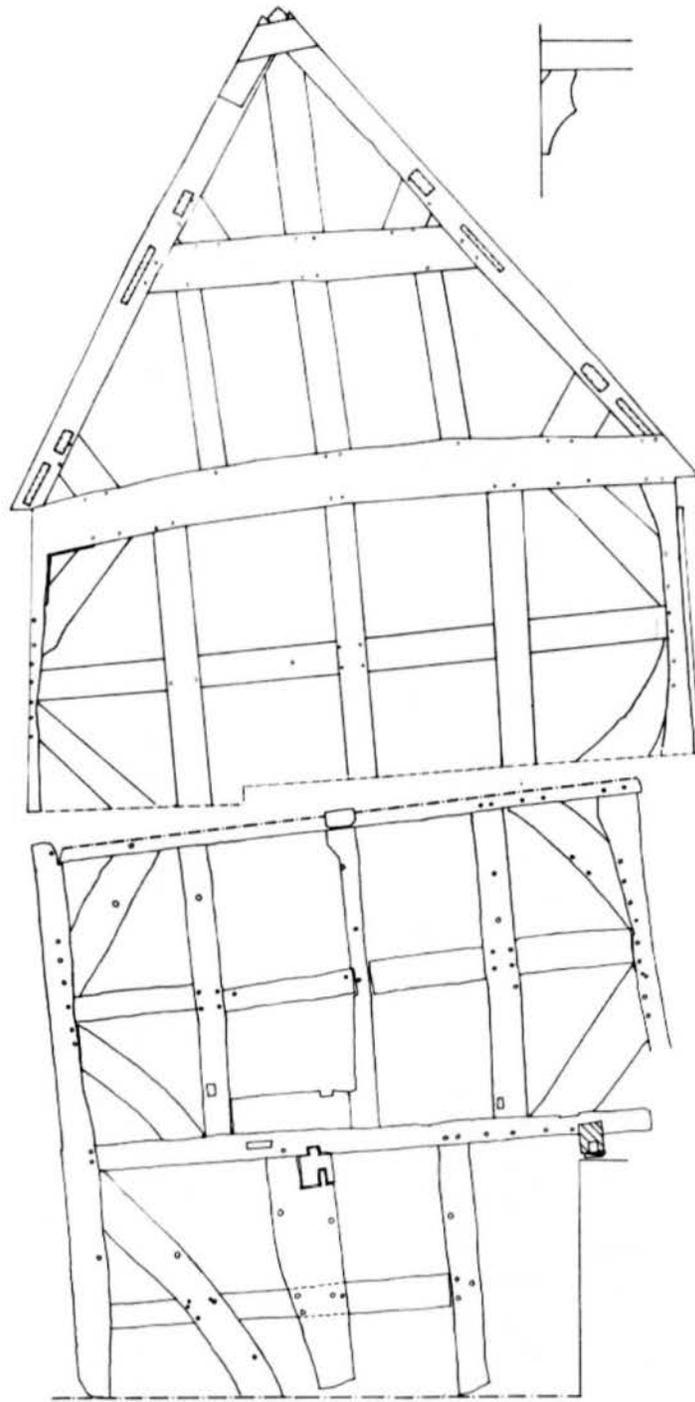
Roof. Truss No.4 [Archive] - J. Sterenberg et al.
